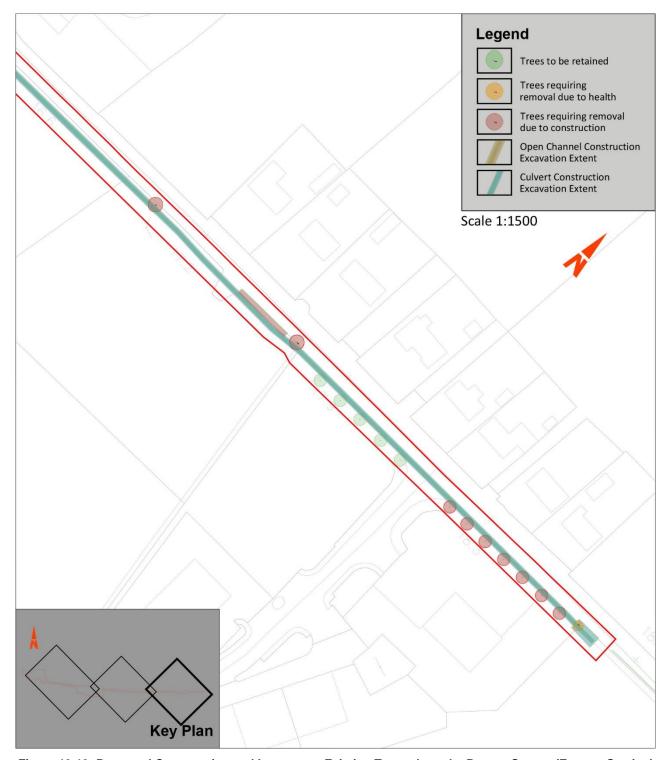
Proposed Construction and Impacts on Existing Trees along the Bunree Stream (Eastern Section)
